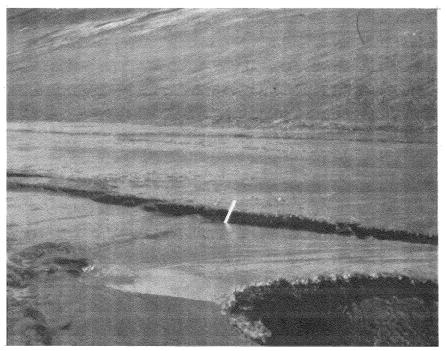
Typical displacement and collapse at Fault I, December 15, 1963.
